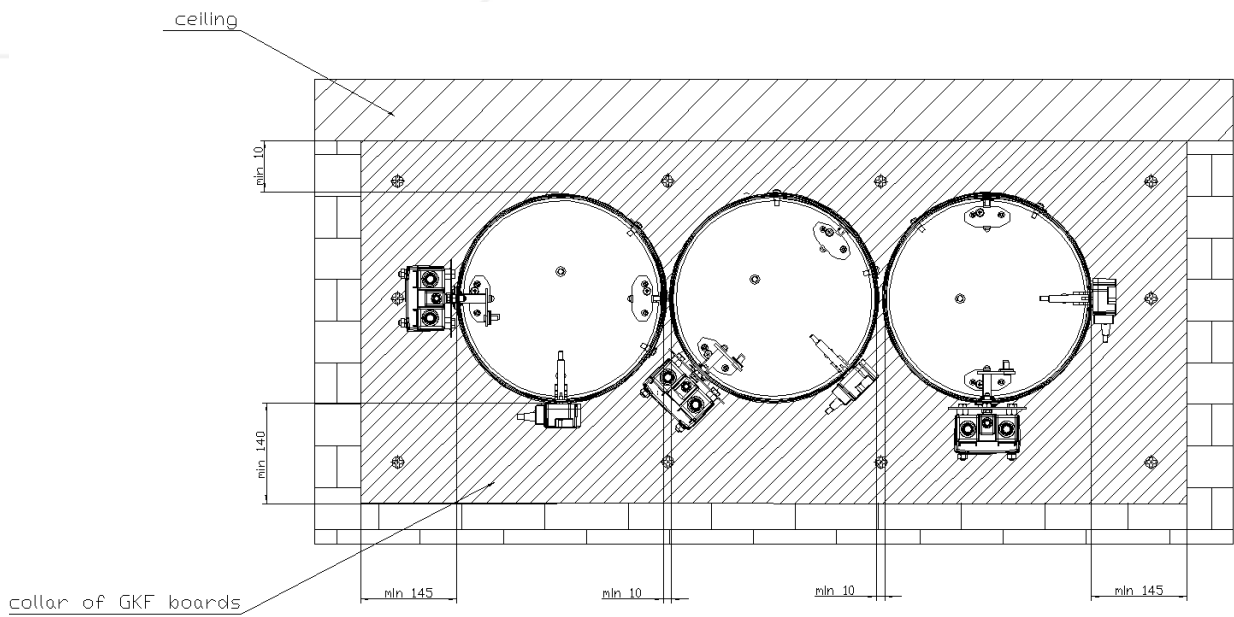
Installation method of KTM-O with minimum distances from adjacent fire dampers and from the ceiling.
